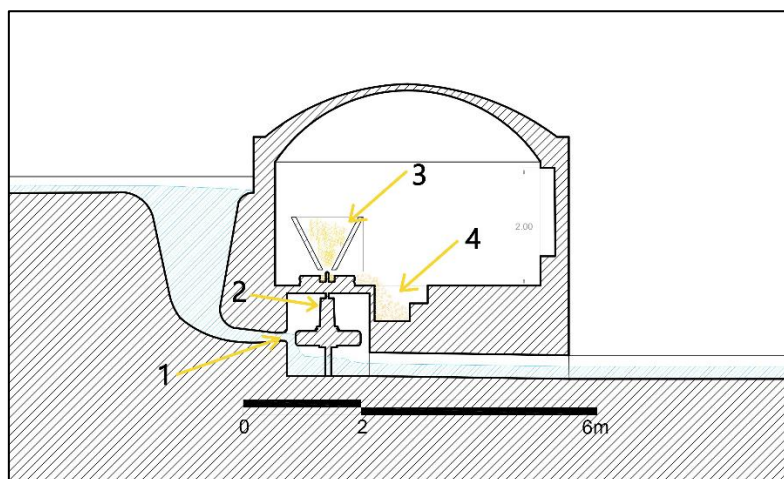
Section B–B: 1) Water outlet duct from the hydraulic tower; 2) Qapān; 3) Dol; 4) Ākhureh.
